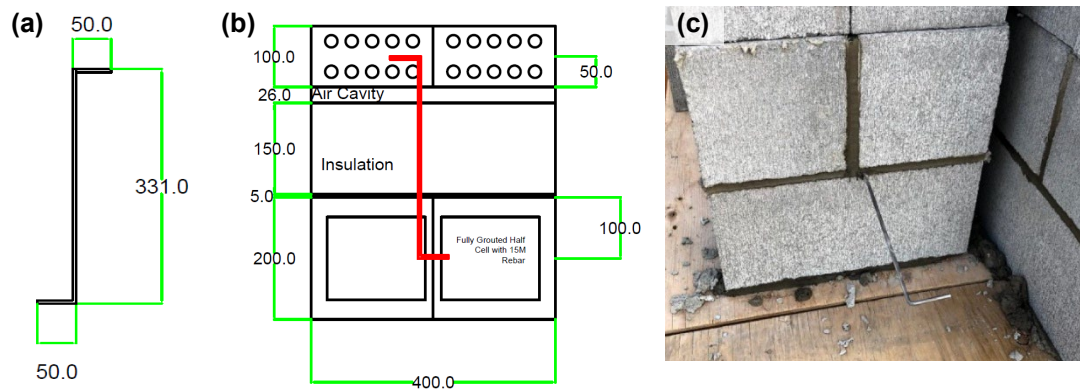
Z-tie connector illustrations (a) Z-tie, (b) wall cross-section with Z-tie, (c) wall specimen without brick veneer. All dimensions in mm.
